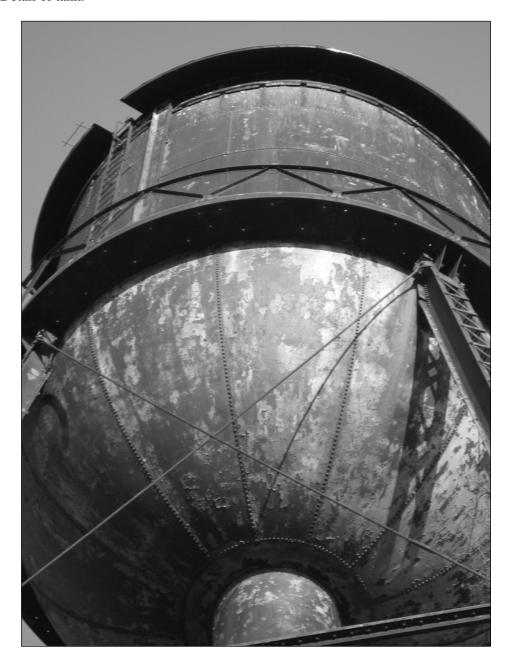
Detail showing tower legs, horizontal bracing, and steel rod cross-braces.
